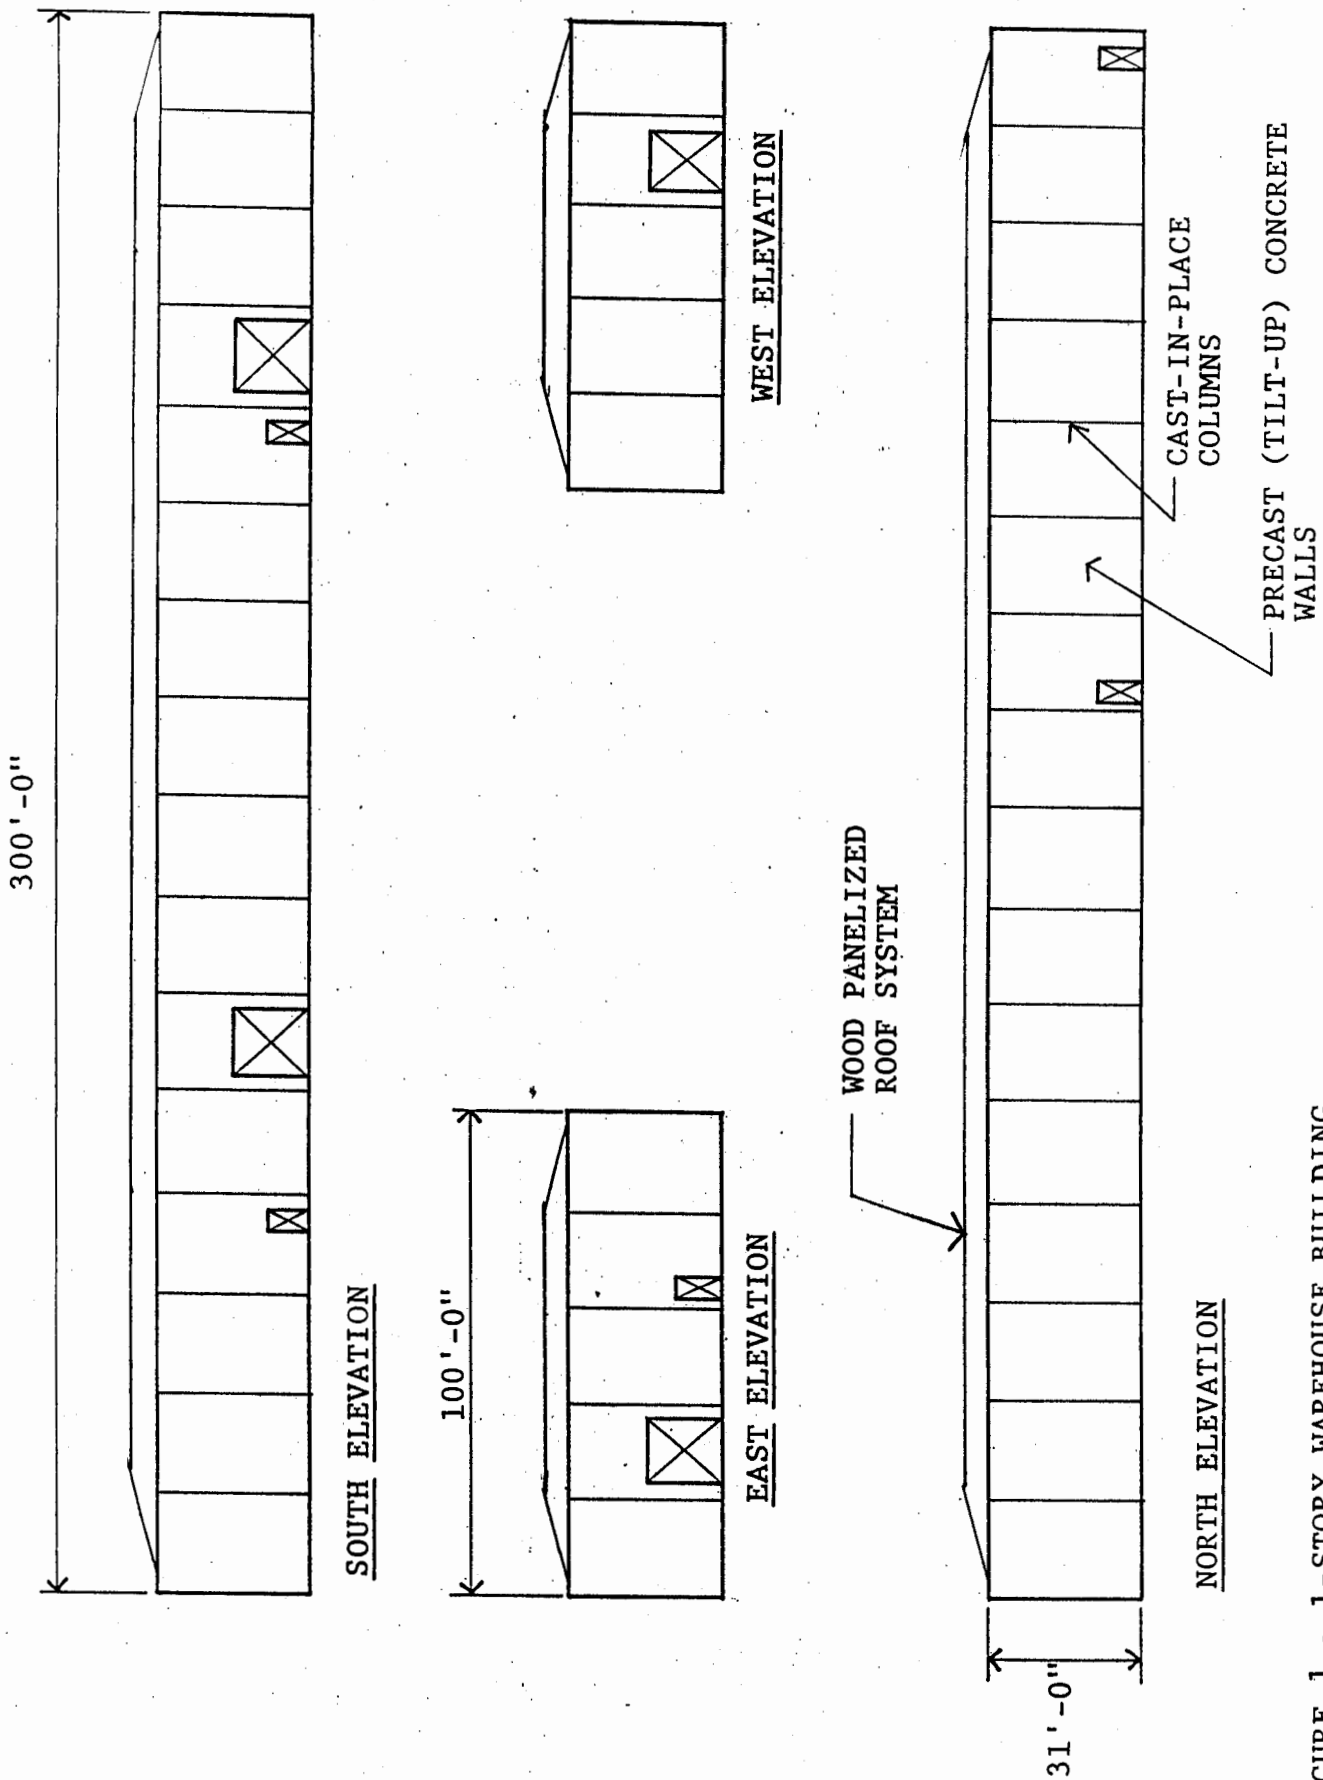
1-STORY WAREHOUSE BUILDING
